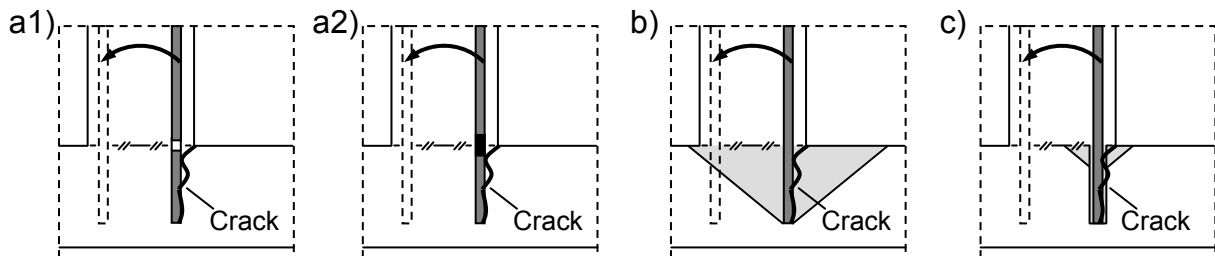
Column-to-foundation connection taken as a group of bonded anchorages: a1) Steel failure mode; a2) Yielding failure mode; b) Concrete breakout failure mode; c) Pullout failure mode
